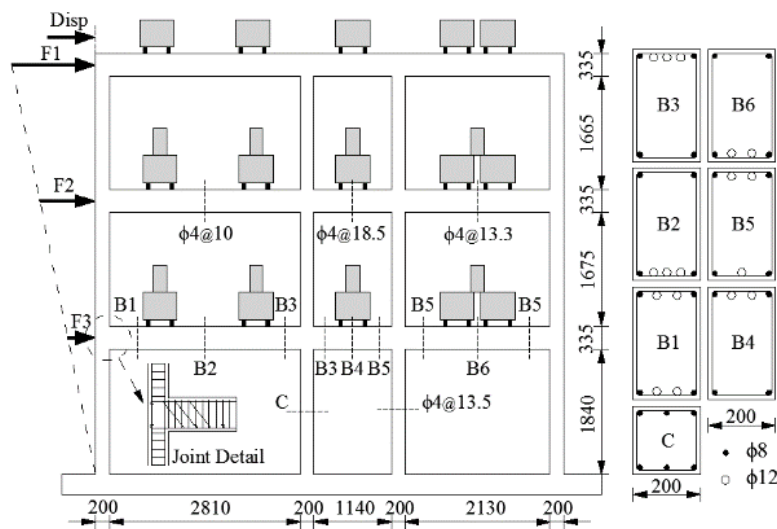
Reinforced concrete frame tested by Calvi et al. [12]
